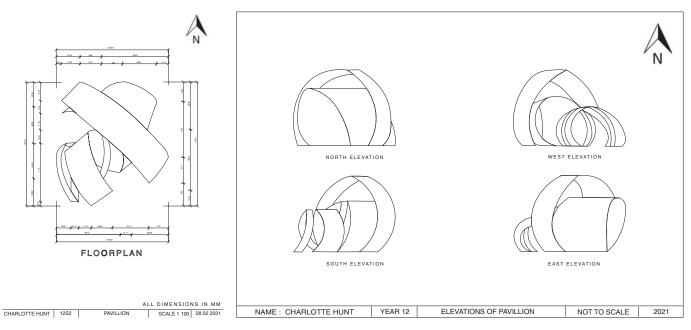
Floorplan and elevations for a pavilion. By Charlotte Hunt
